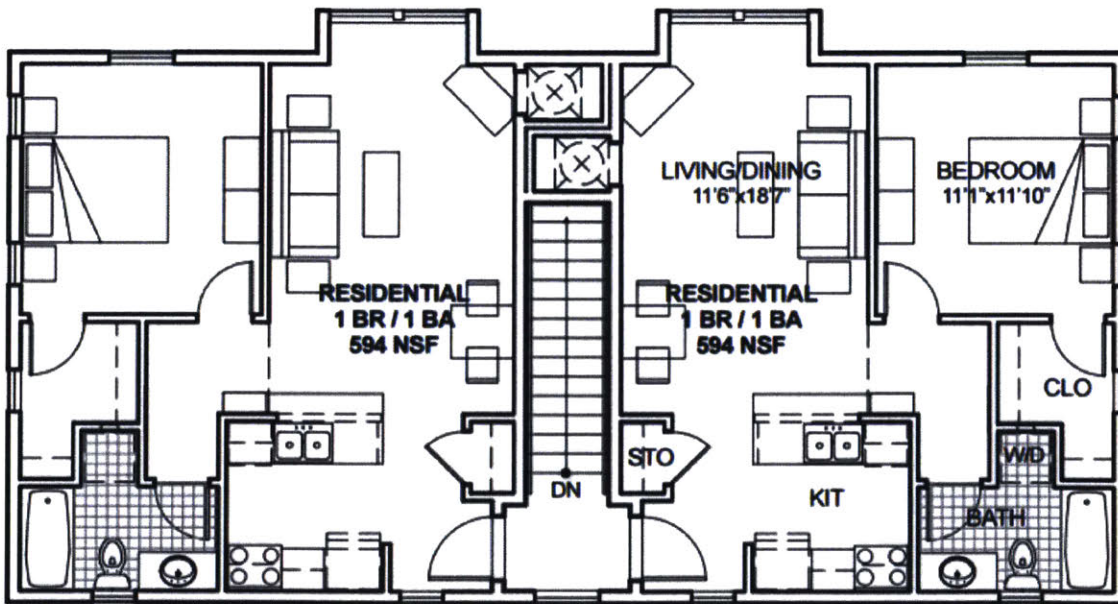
Sample 1 Bedroom Units for the 14 and 18 Unit Plans (Located Above Private Garages) *Actual SF Will Range 600-640⁴⁹
